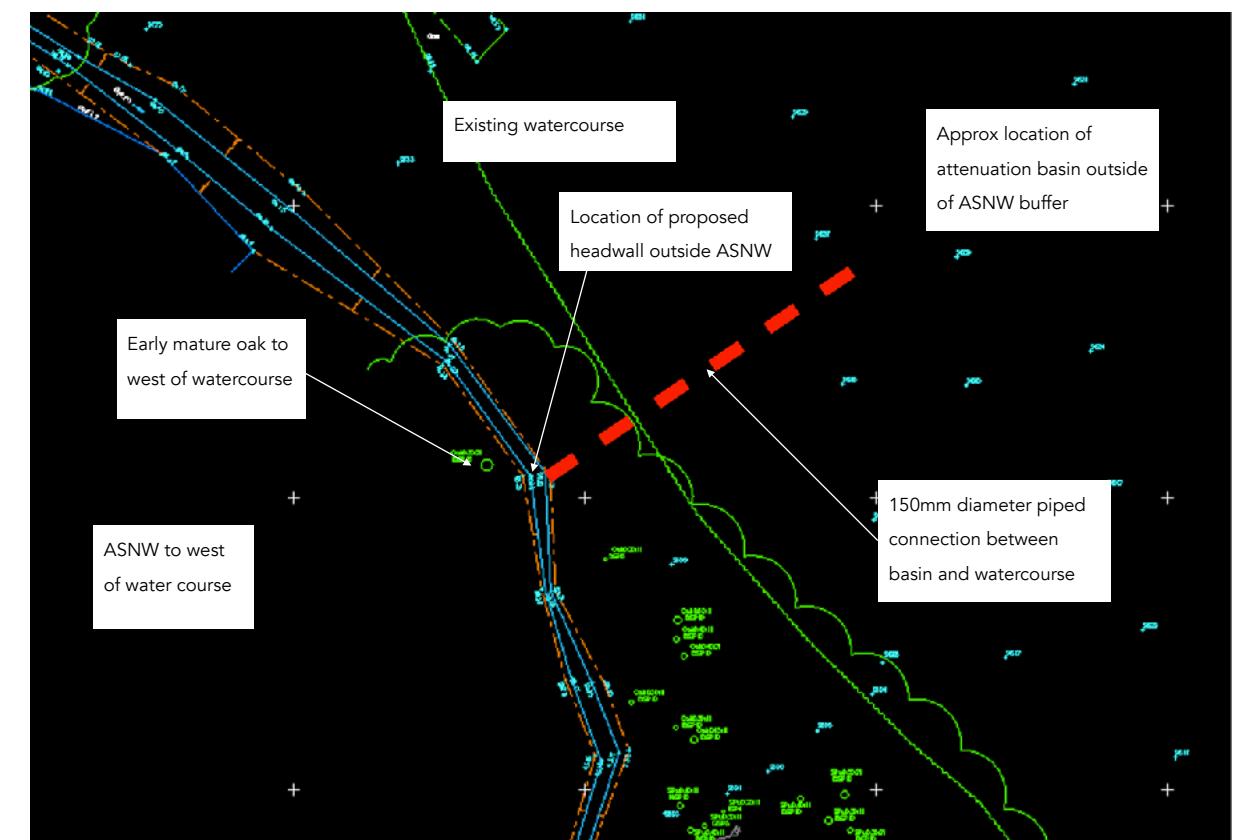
arrangement for surface water drainage outfall next to ASNW.
